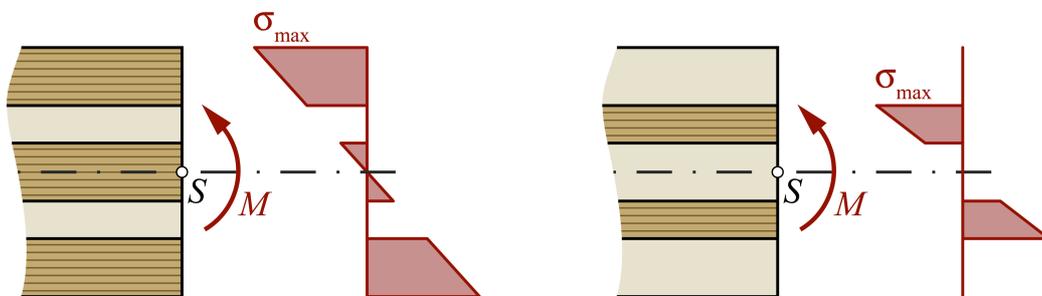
Normal stress distribution over the cross section of a CLT element loaded in bending out-of-plane assuming  $E_{90,lay} = 0$ : longitudinal layers as top layers (left); cross layers as top layers (right).
